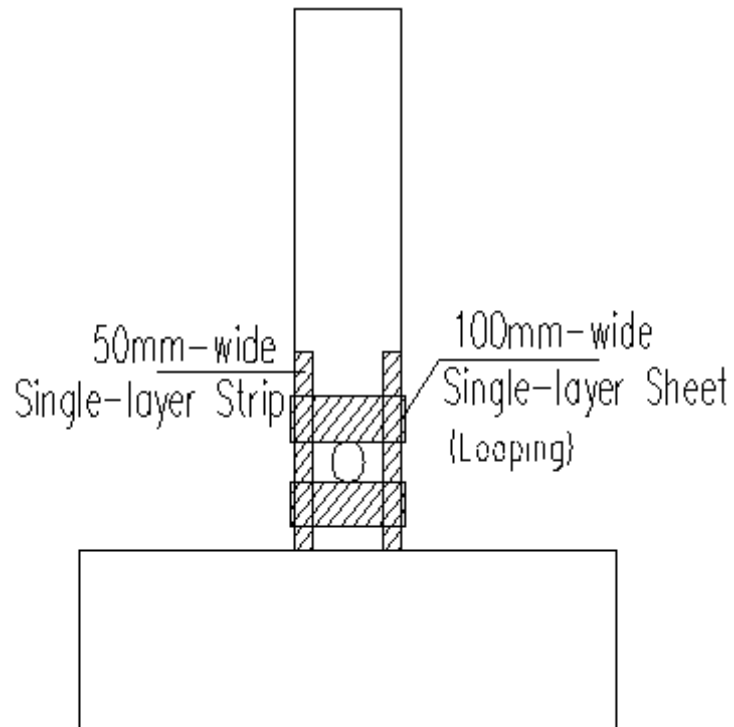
Strengthening method with horizontal arrangement (Beams LC1, LC2-1, LC3).
